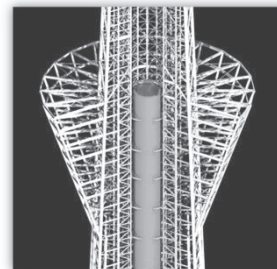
Core – wall (Central pillar) of the Tokyo Skytree [17]
